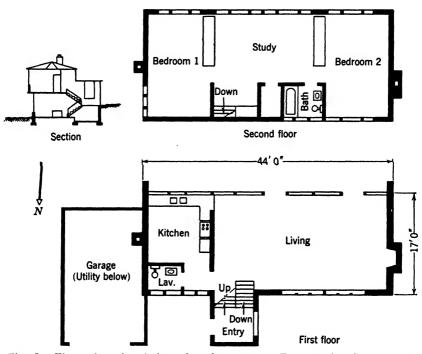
Floor plans for design of radiant system, Example 1. Courtesy of Olindo Grossi, Architect.
